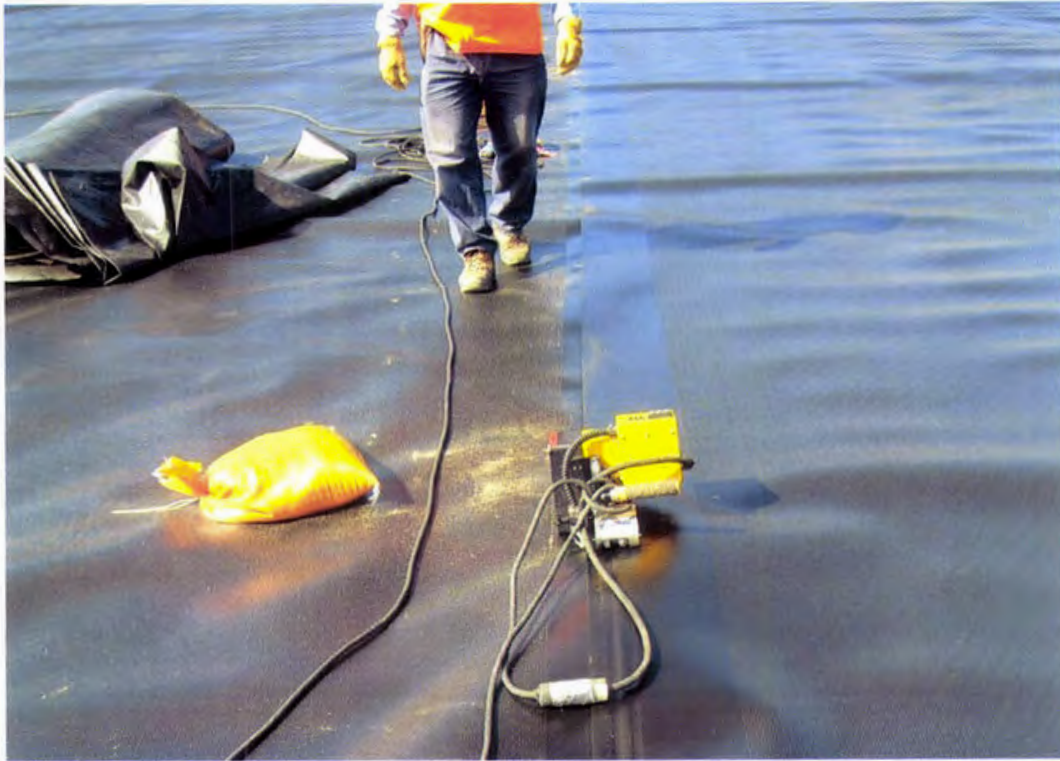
Production seaming subbase 60 mil HDPE geomembrane using a double-fusion wedge welder
